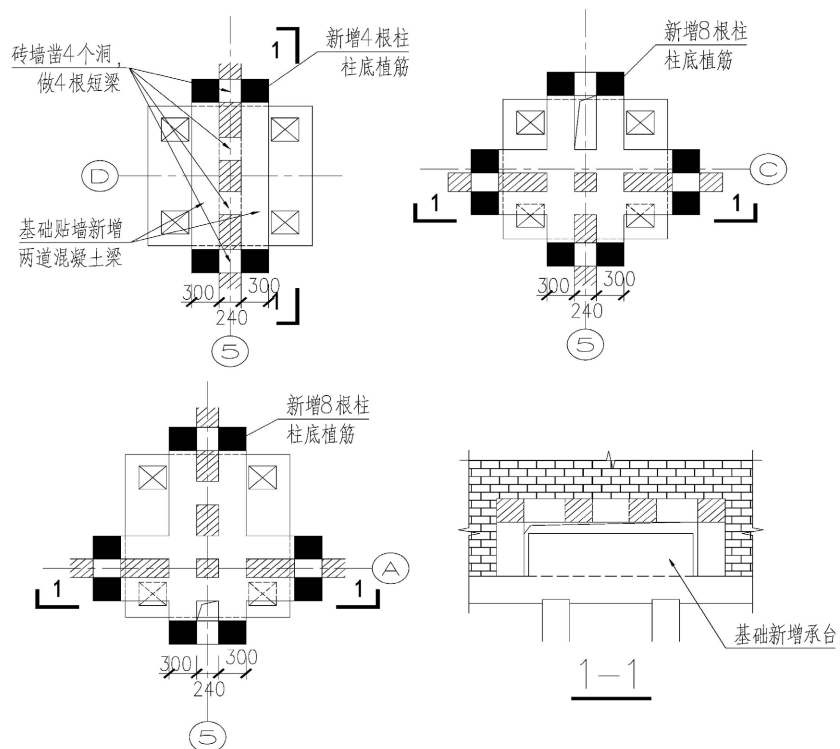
Masonry wall underpinning details with construction of foundation cushion caps
